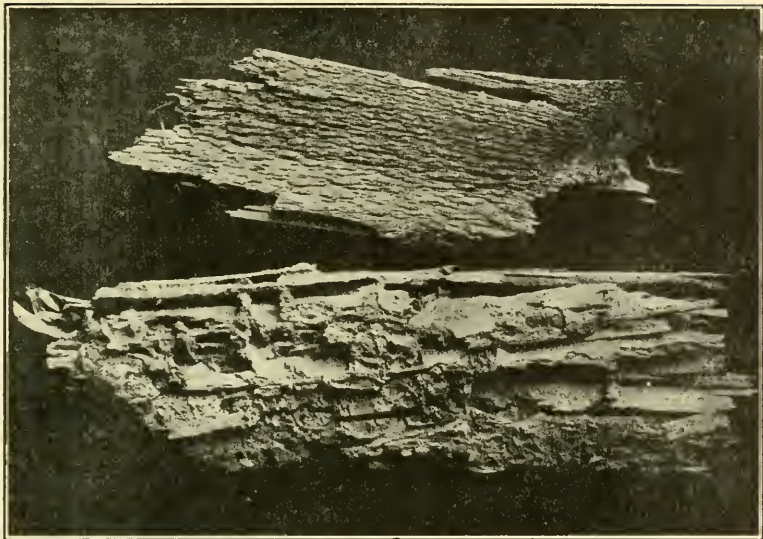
, A. At the top is a small section of a beam, showing surface apparently sound and giving no indication of the damage beneath. The lower piece shows galleries filled with frass.
